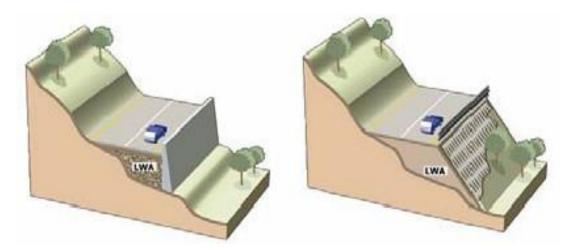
Leca LWA used in combination with a retaining wall or reinforced slope
